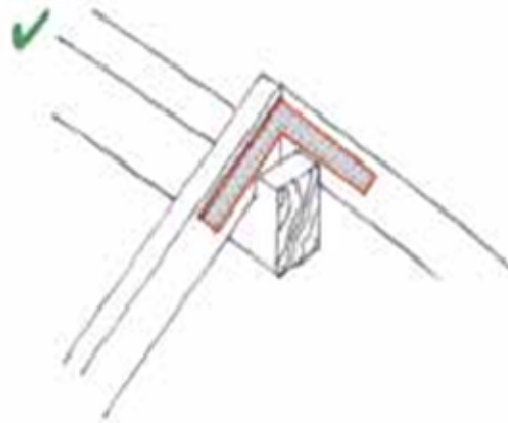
Joints in the wood would have to be strong and impregnable; wood-frame has to be properly anchored within the foundation through nut and bolt, so that frame is not de-linked from the base. (Sketch Credit-IFRC)
